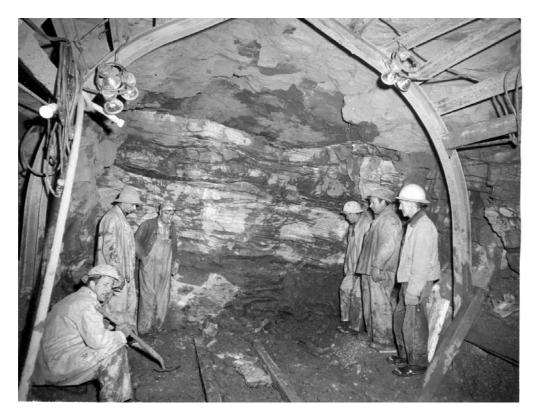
Lemon Dam - Red siltstone of the Cutler Formation exposed in the outlet works tunnel.
